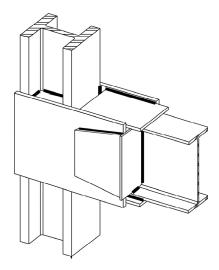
Proprietary Side Plate Connection – Application to Existing Construction
